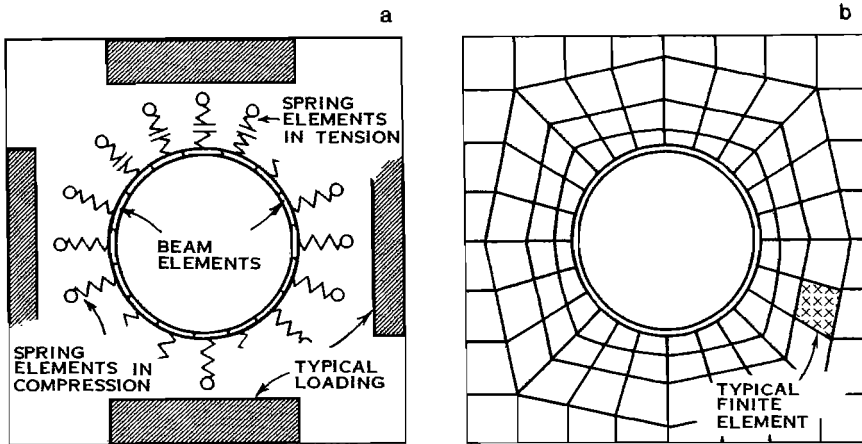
Models for tunnel engineering - examples. (a) Beam element model with elastic support. (b) Finite element model.
